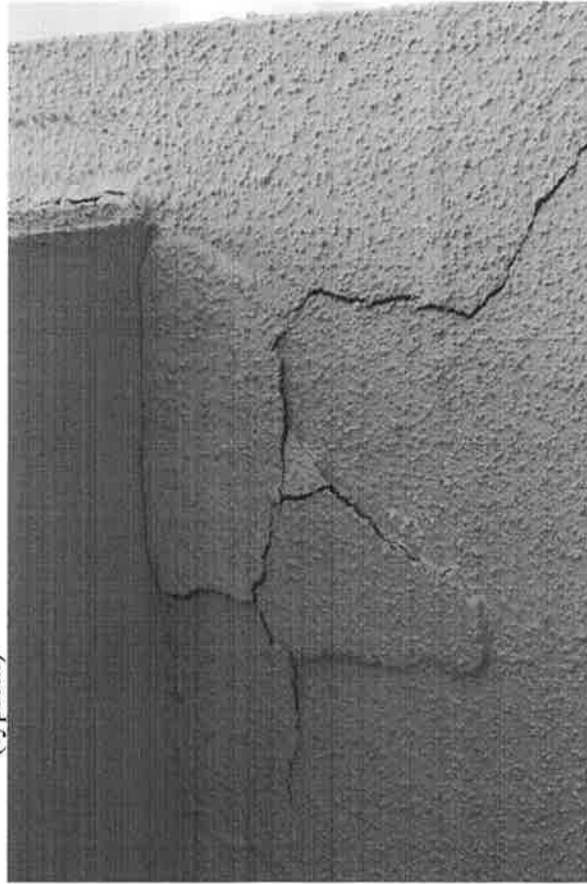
Prior repair to crack in CMU wall at unit 1404 (typical)
